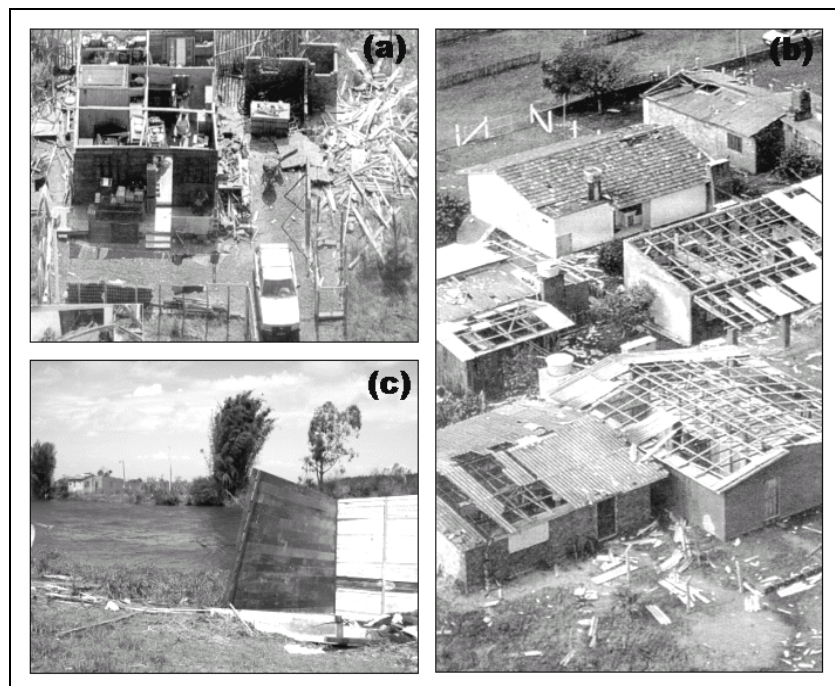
Types of damages caused by wind force at Passos de Torres (SC): (a and b) widespread roof failure; and (c) house blown across the Mampituba River, divisor between the Rio Grande do Sul and Santa Catarina States.
